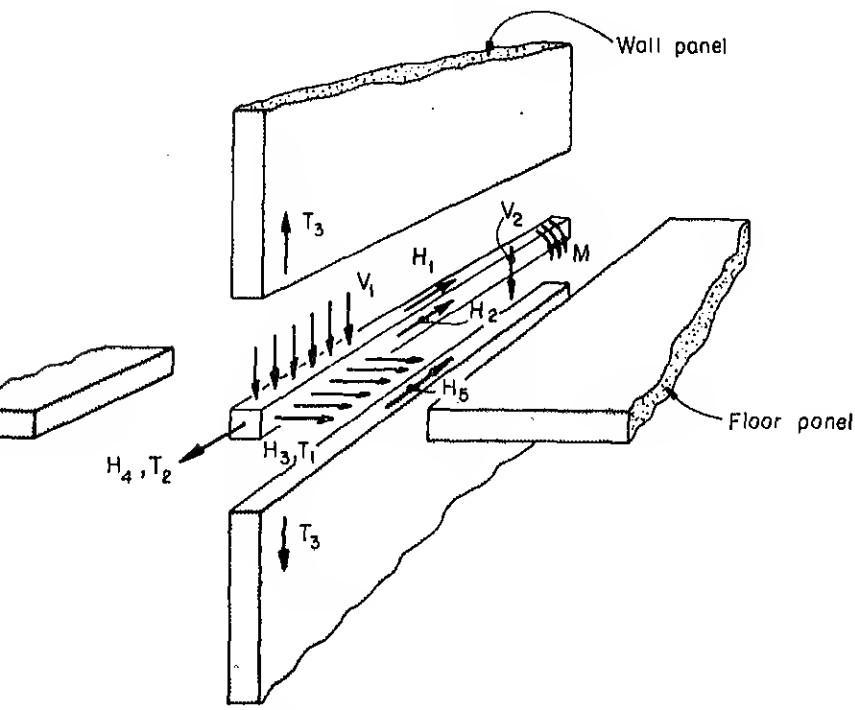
Exploded View of an Interior Floor-to-Wall Connection and the Various Connection Forces
